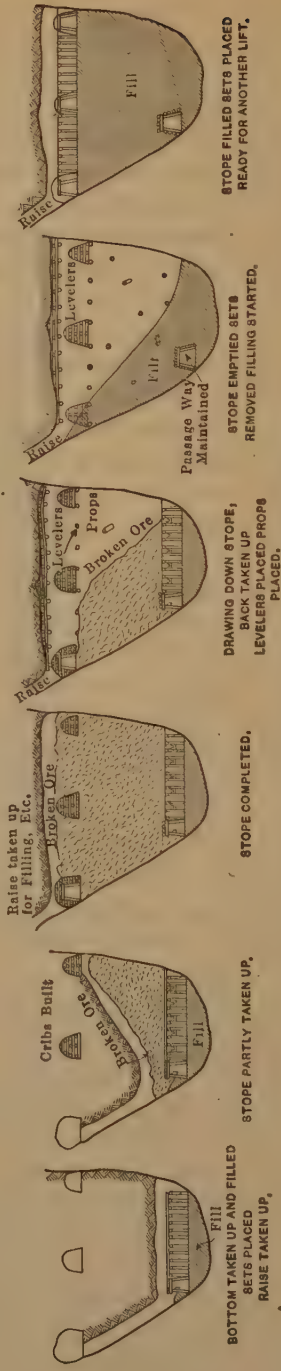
LONGITUDINAL SECTIONS OF TRANSVERSE STOPE.
